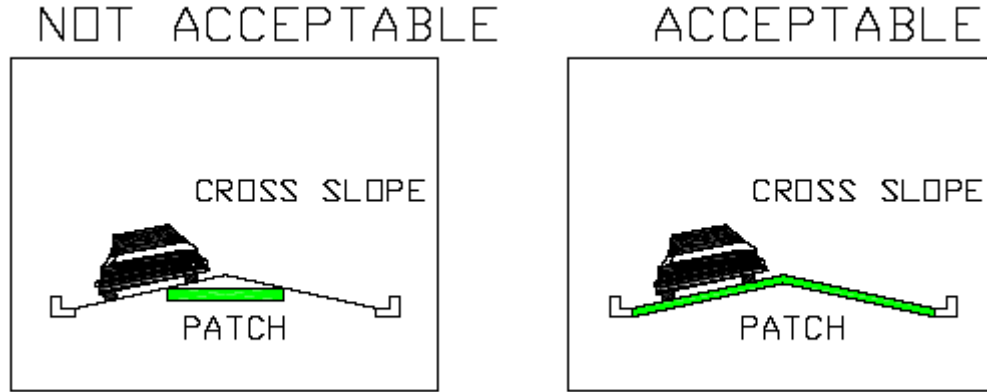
Example 11. Patch slope and grade must match existing pavement.
